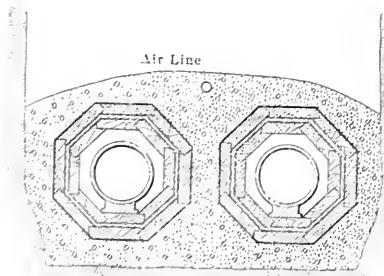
CROSS-SECTION OF CONDUIT FOR WATER LINE
